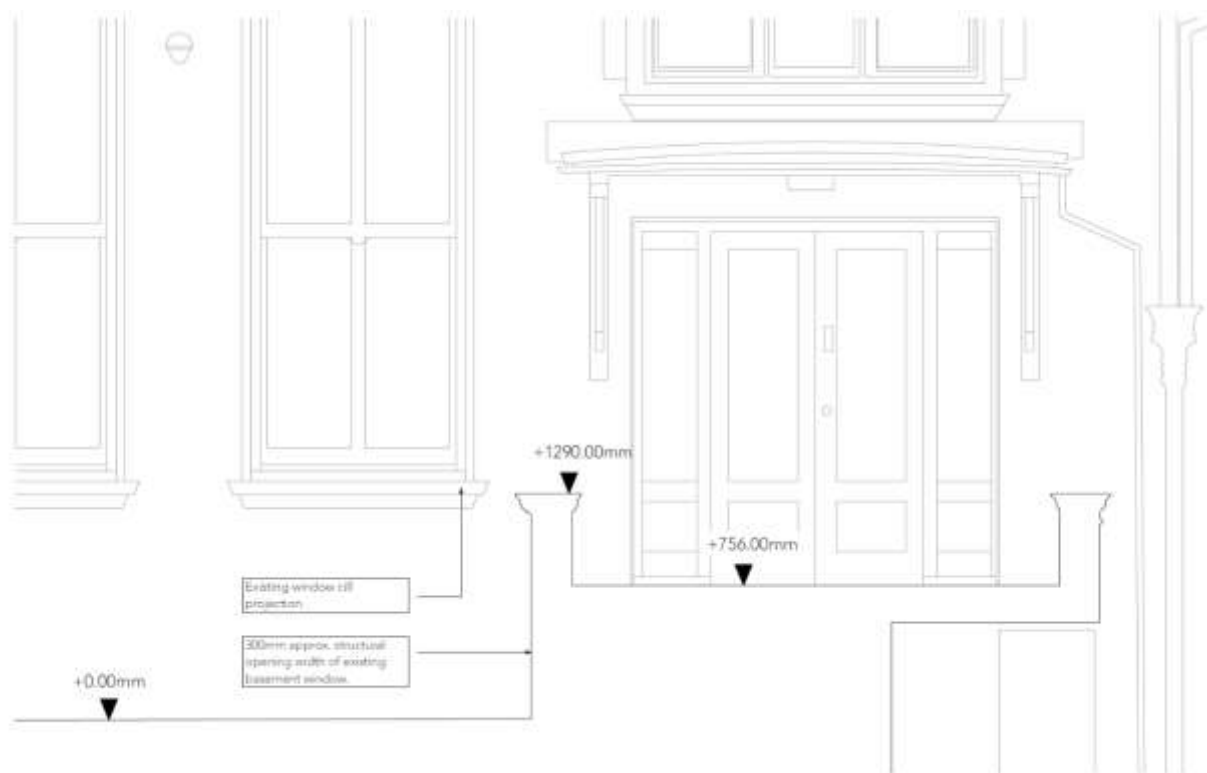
Existing Section 01 looking toward the building's southern elevation.
